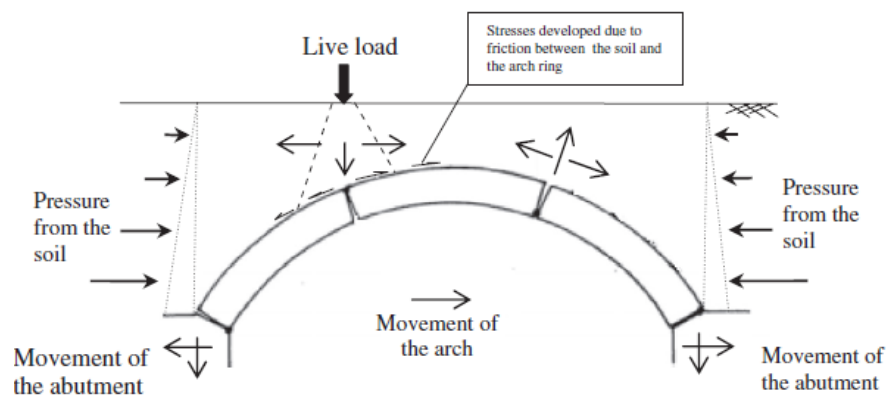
Schematic structural behaviour of a masonry arch bridge. [7]
